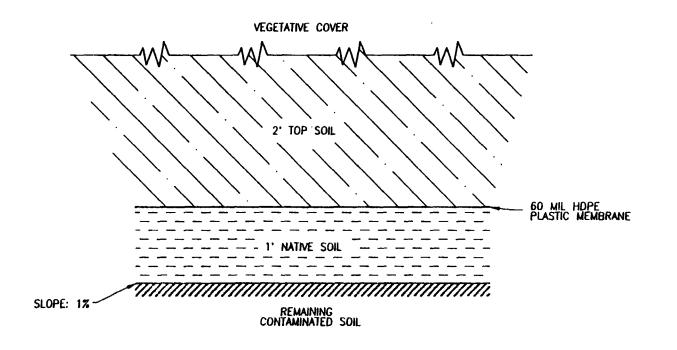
FIGURE ECC REMEDIAL ACTION PLAN 3 CROSS SECTION OF SOIL COVER 10/27/88
